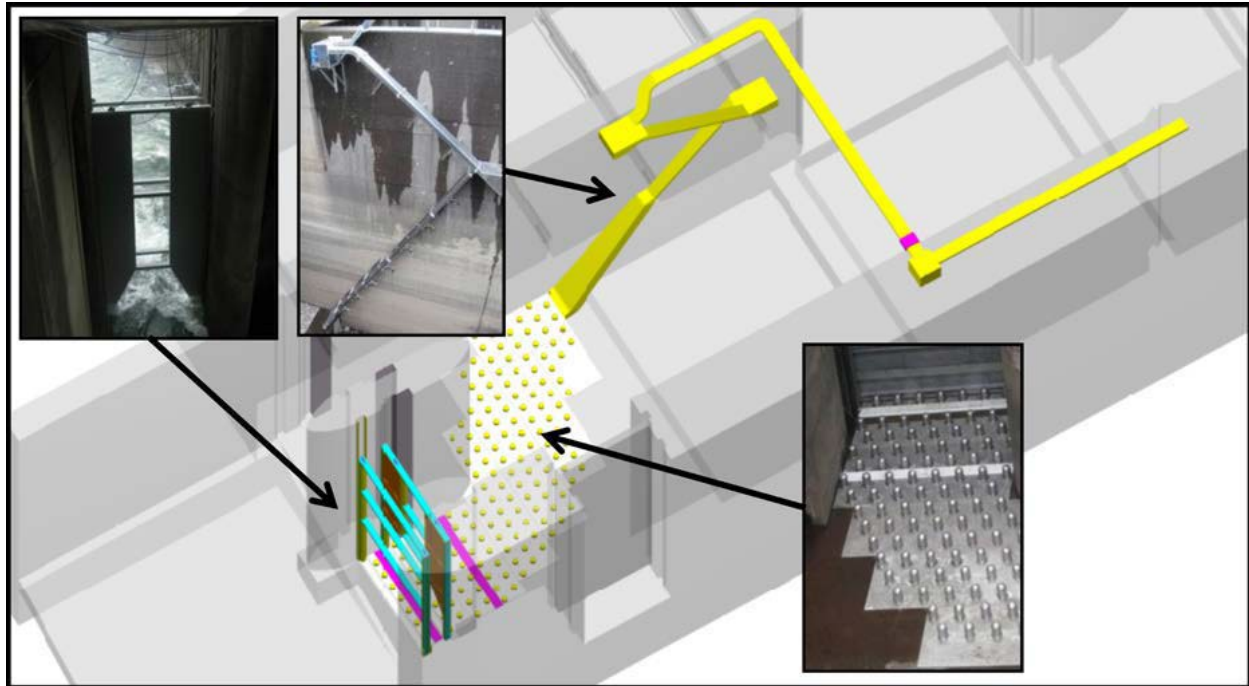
Images of wetted wall structure showing the collector (left) and exit (right) sections. The prototype wetted wall was installed in the serpentine weir section of the Bradford Island fishway at Bonneville Dam. Source: Frick et al. 2019.
